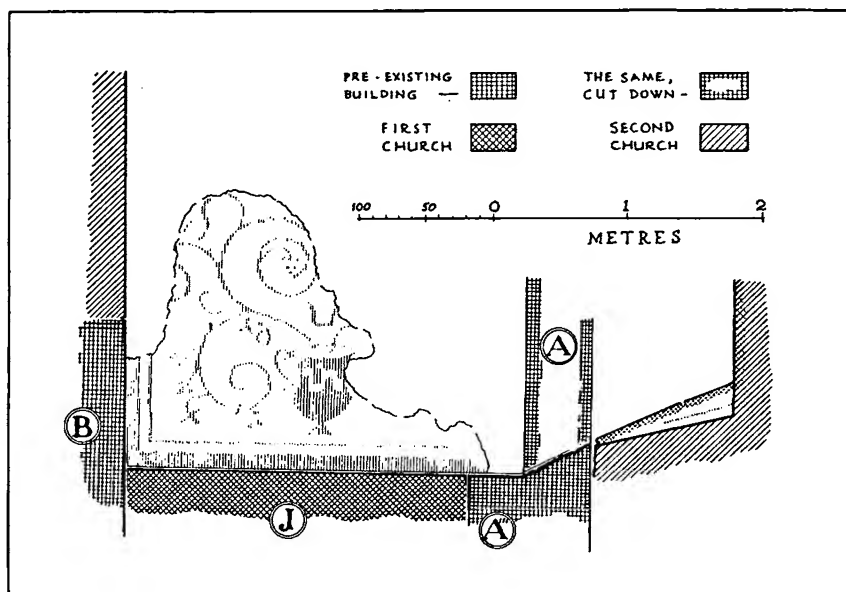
S. Marco. Walls and pavement at south end of east aisle (Sketch: Corbett).
